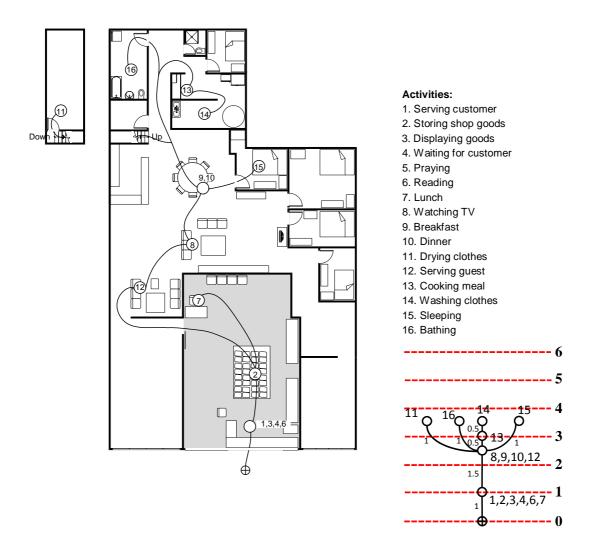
Activity Network on House Floor Plan of Chinese (C-01)
